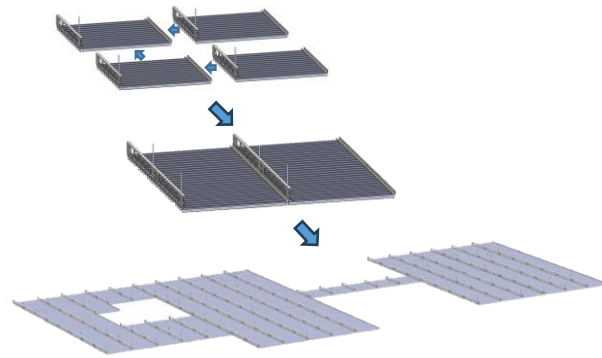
Modular and extendable Ceiling Structure, fitting arbitrary building geometries
